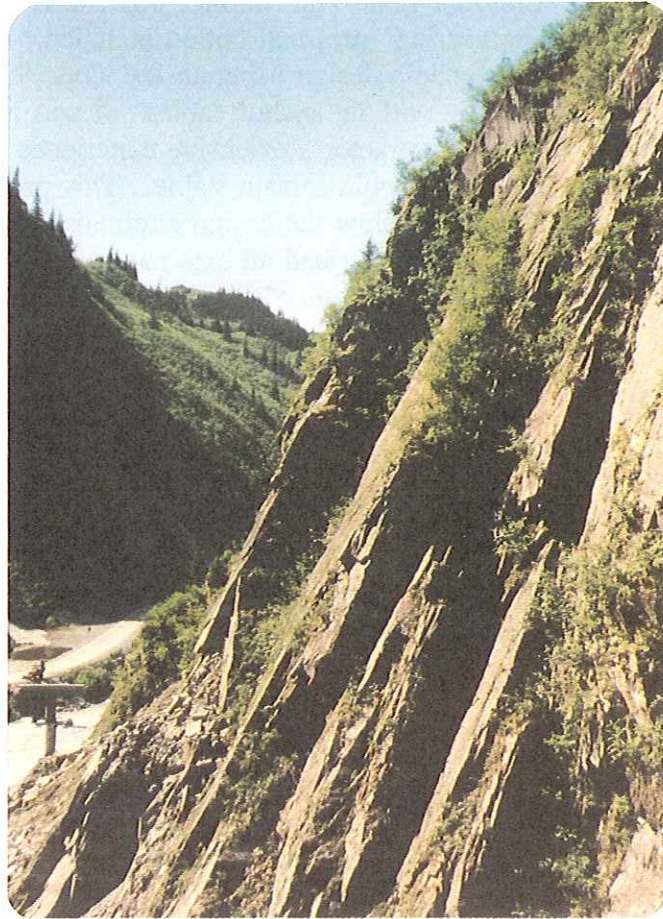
A 300 foot (91.5 meter) high rock cut was proposed to develop new alignment. Note the bridge pier in the river. The bedding in the rock dipped at about 65° toward the river. The design recommended a wide catch ditch at the toe with the upper slope to be excavated to the dip angle with no benches. Scaling and bolting and drain holes were recommended as excavation developed.
